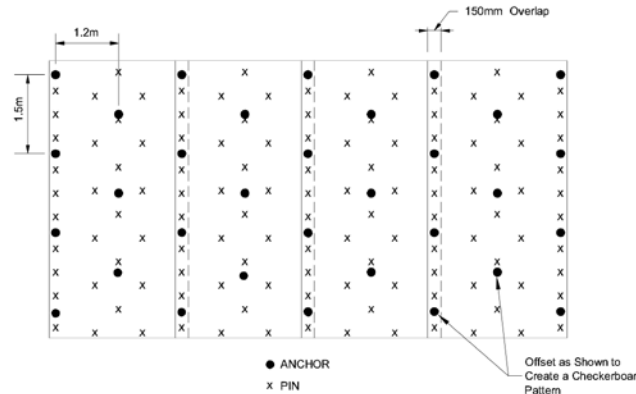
ANCHOR / PIN PATTERN DETAIL
